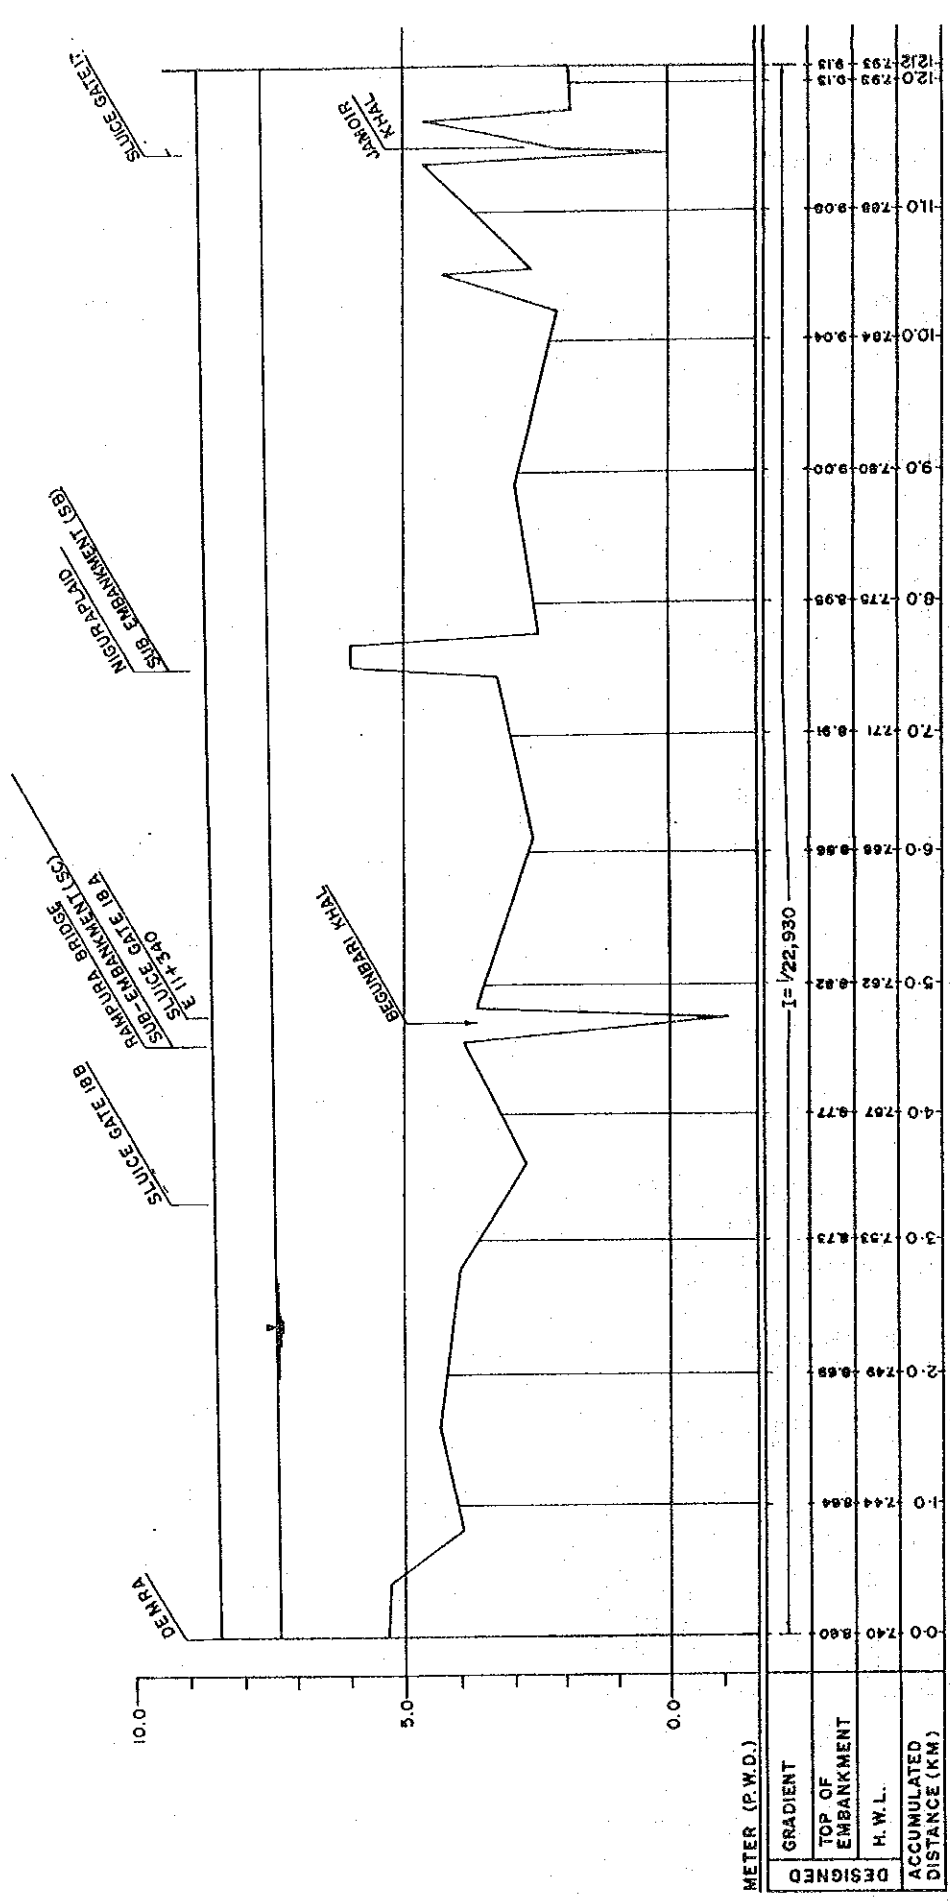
(1) LONGITUDINAL SECTION OF EMBANKMENT : DHAKA EAST (E1)
